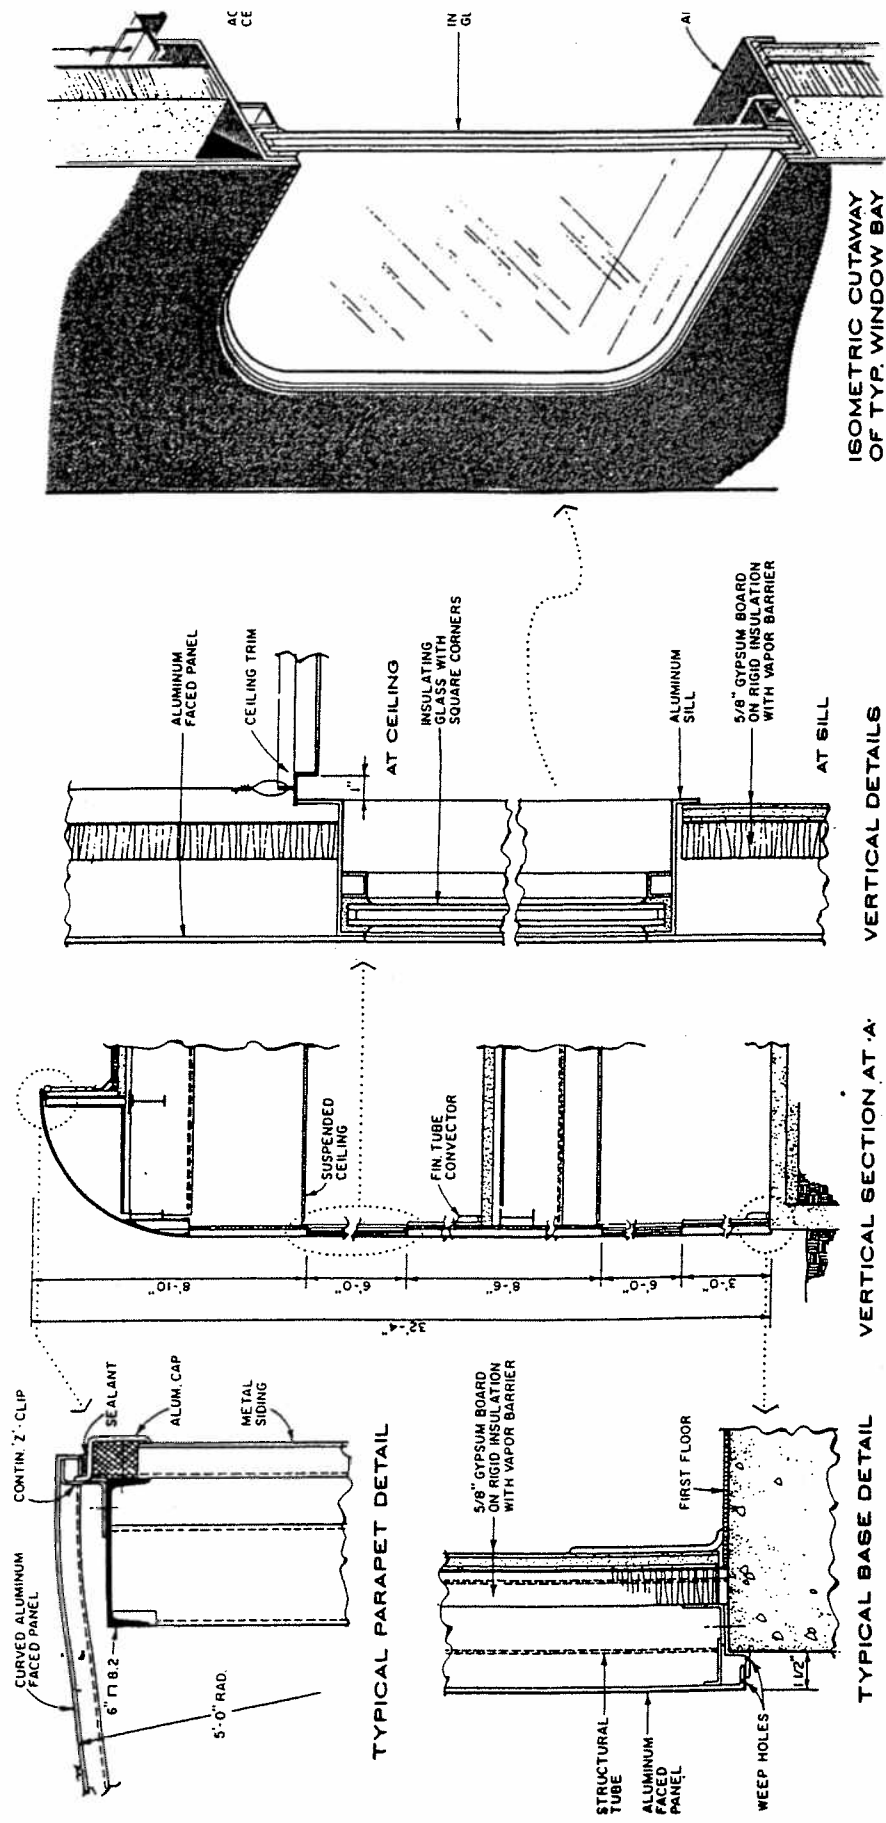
Construction details for parapet, base and wall section, COMSAT Laboratories (Cesar Pelli for DMJM architect) Clarksburg, MD, delineated 1967 Source: Cesar Pelli & Associates architects
